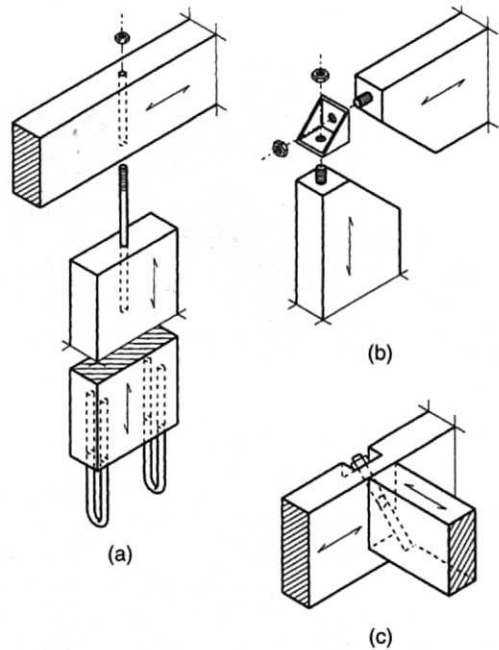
Screws used to connect a rafter to a glulam arch, and a column to a steel anchor
